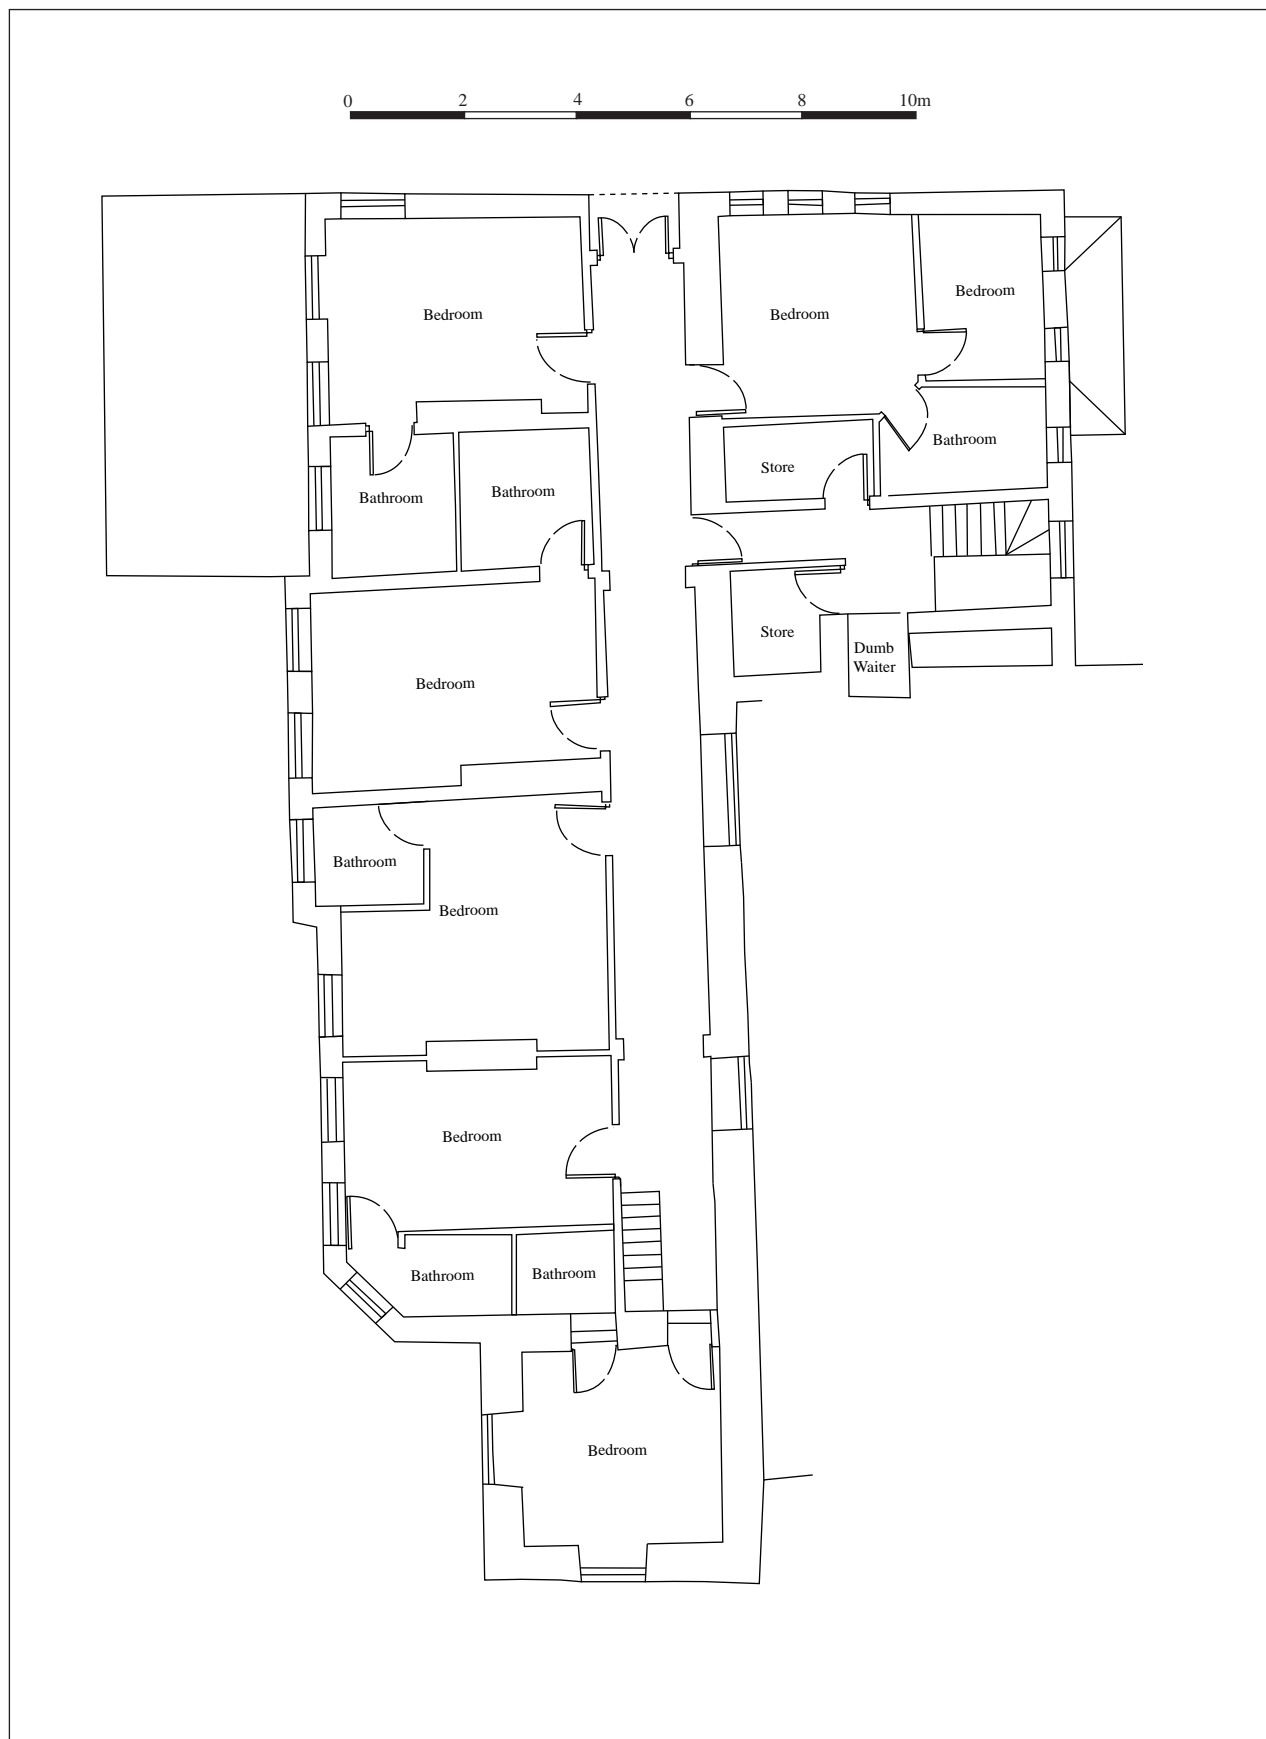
Second Floor Plan of 1919 Extension, Deganwy Castle Hotel
